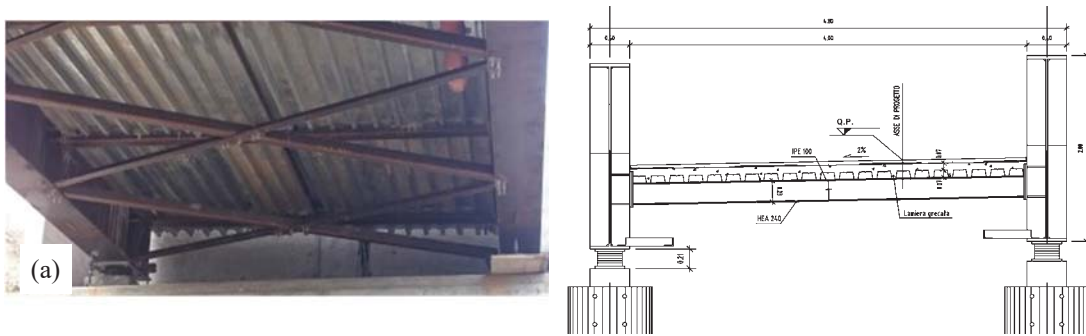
Lambro footbridge: (a) view from below; and (b) cross-section.
